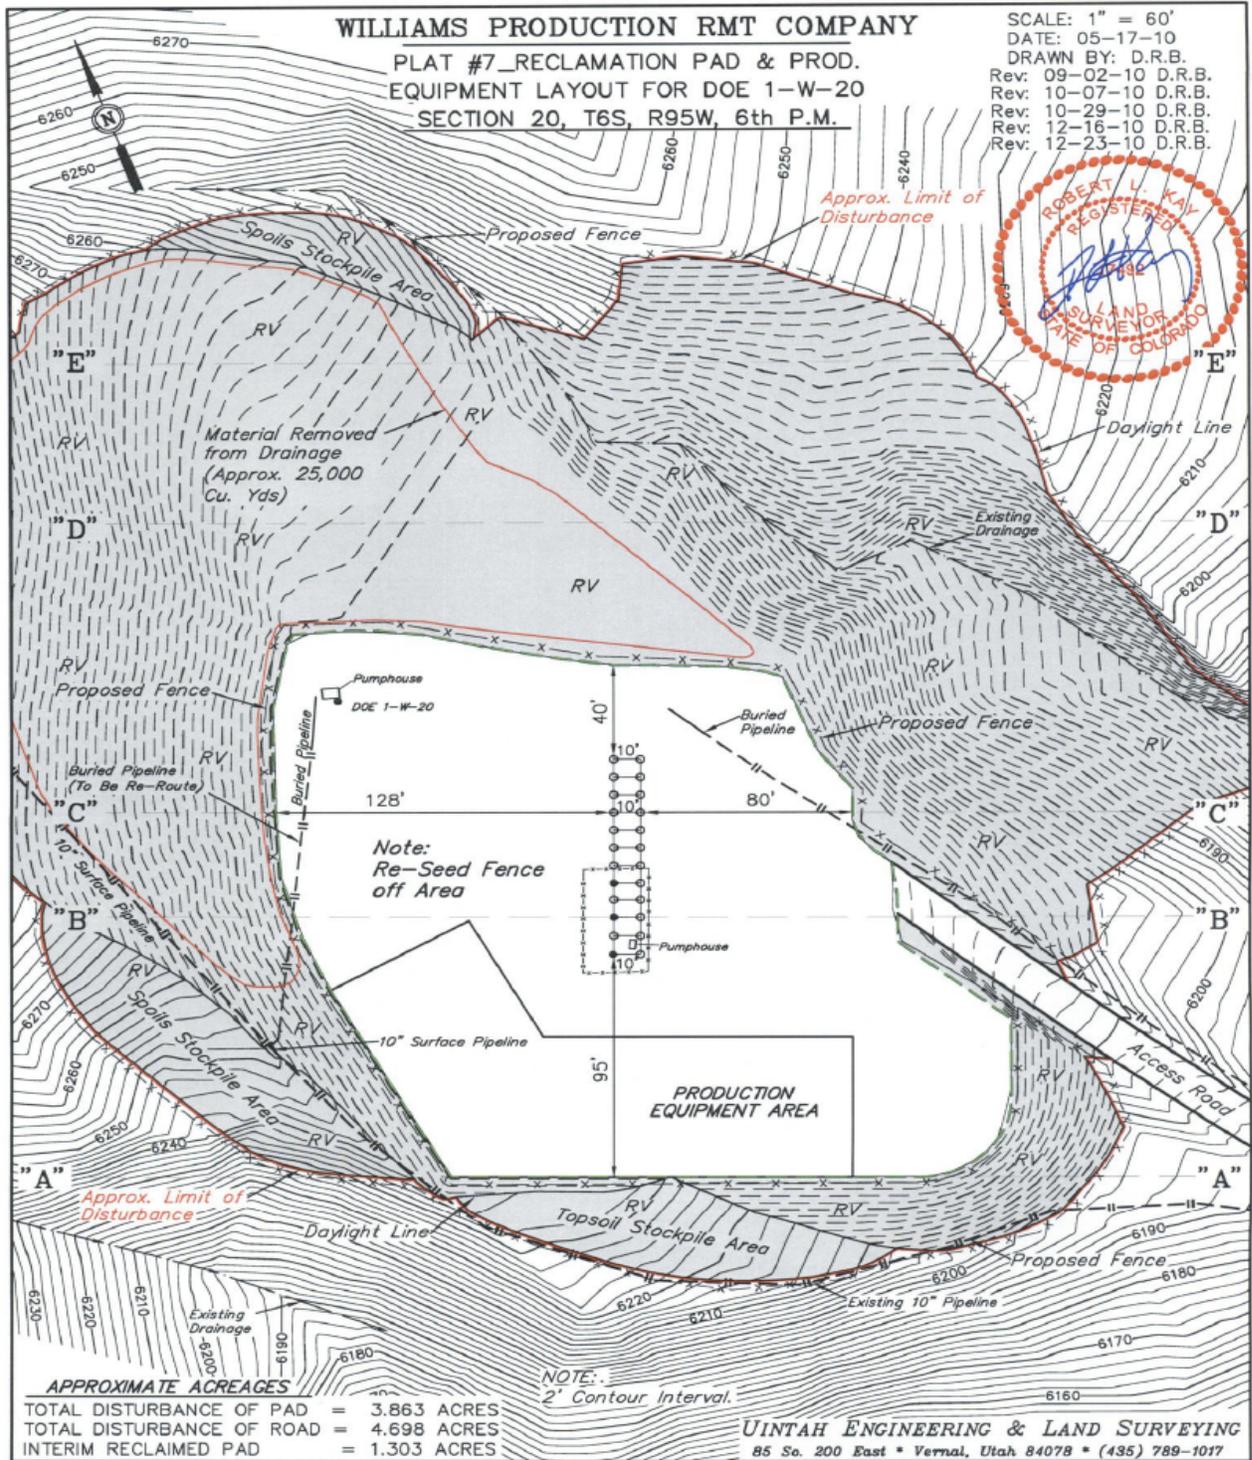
Reclamation Plan for Interim Reclamation Stage.
